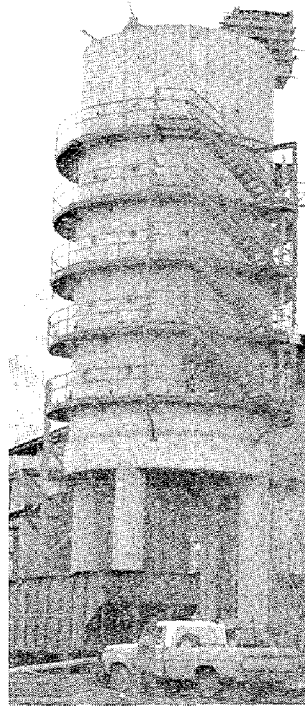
SPRAY TOWER STRUCTURE - SOUTH SOUTHWEST VIEW
